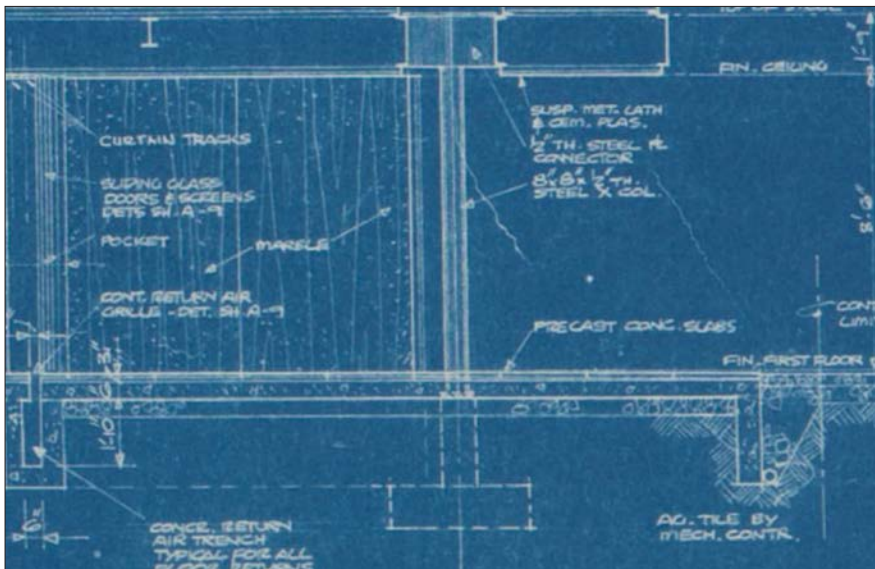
Detail floor slab at exterior walls and plinth, Sheet A-10. Date 1955
